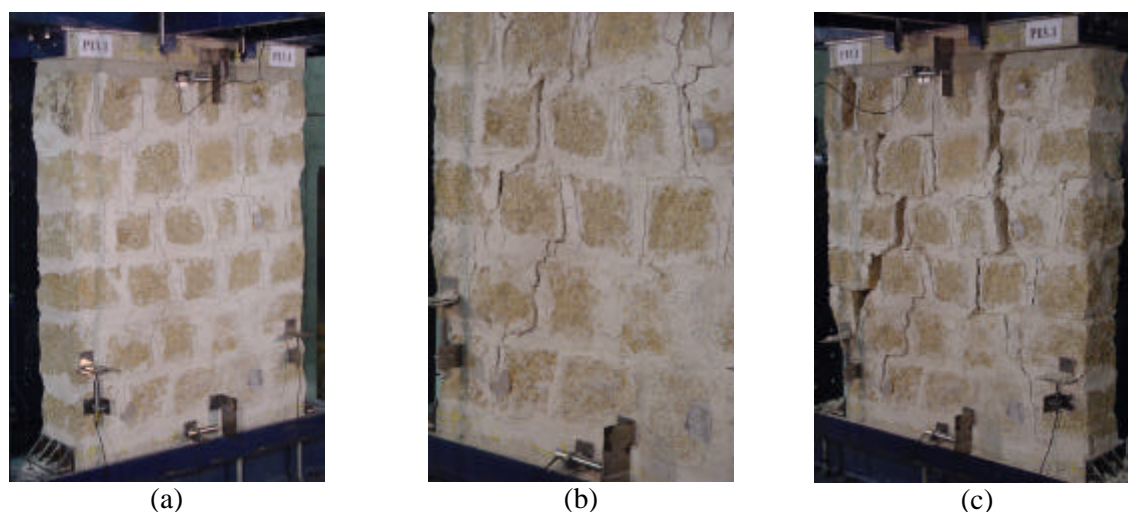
Crack patterns and collapse mode of the wall WI1.175; (a) shrinkage cracks before testing; (b) propagation of cracks towards the lower left corner; (c) collapse of the wall
